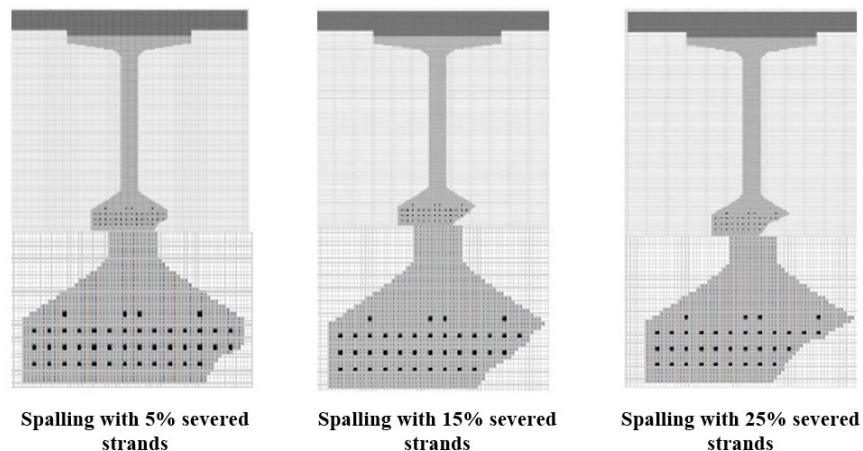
Modeling of beams with spalled concrete and severed strands (Tabatabai and Nabizadeh 2019)
